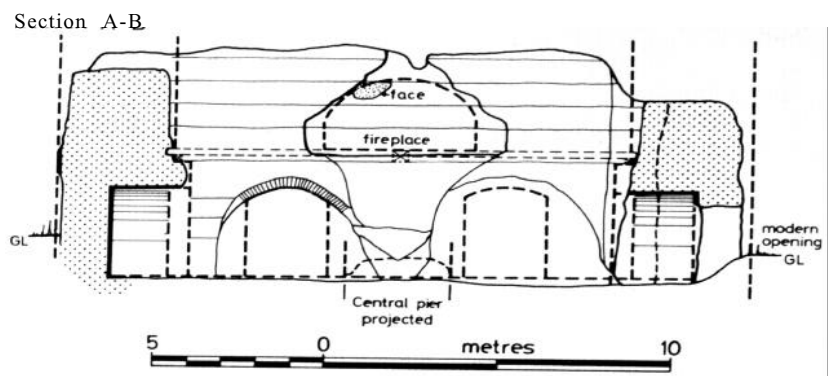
Walden Castle, section A-B; for line of section, see Pl 9. The turret built in 1796 has been omitted
